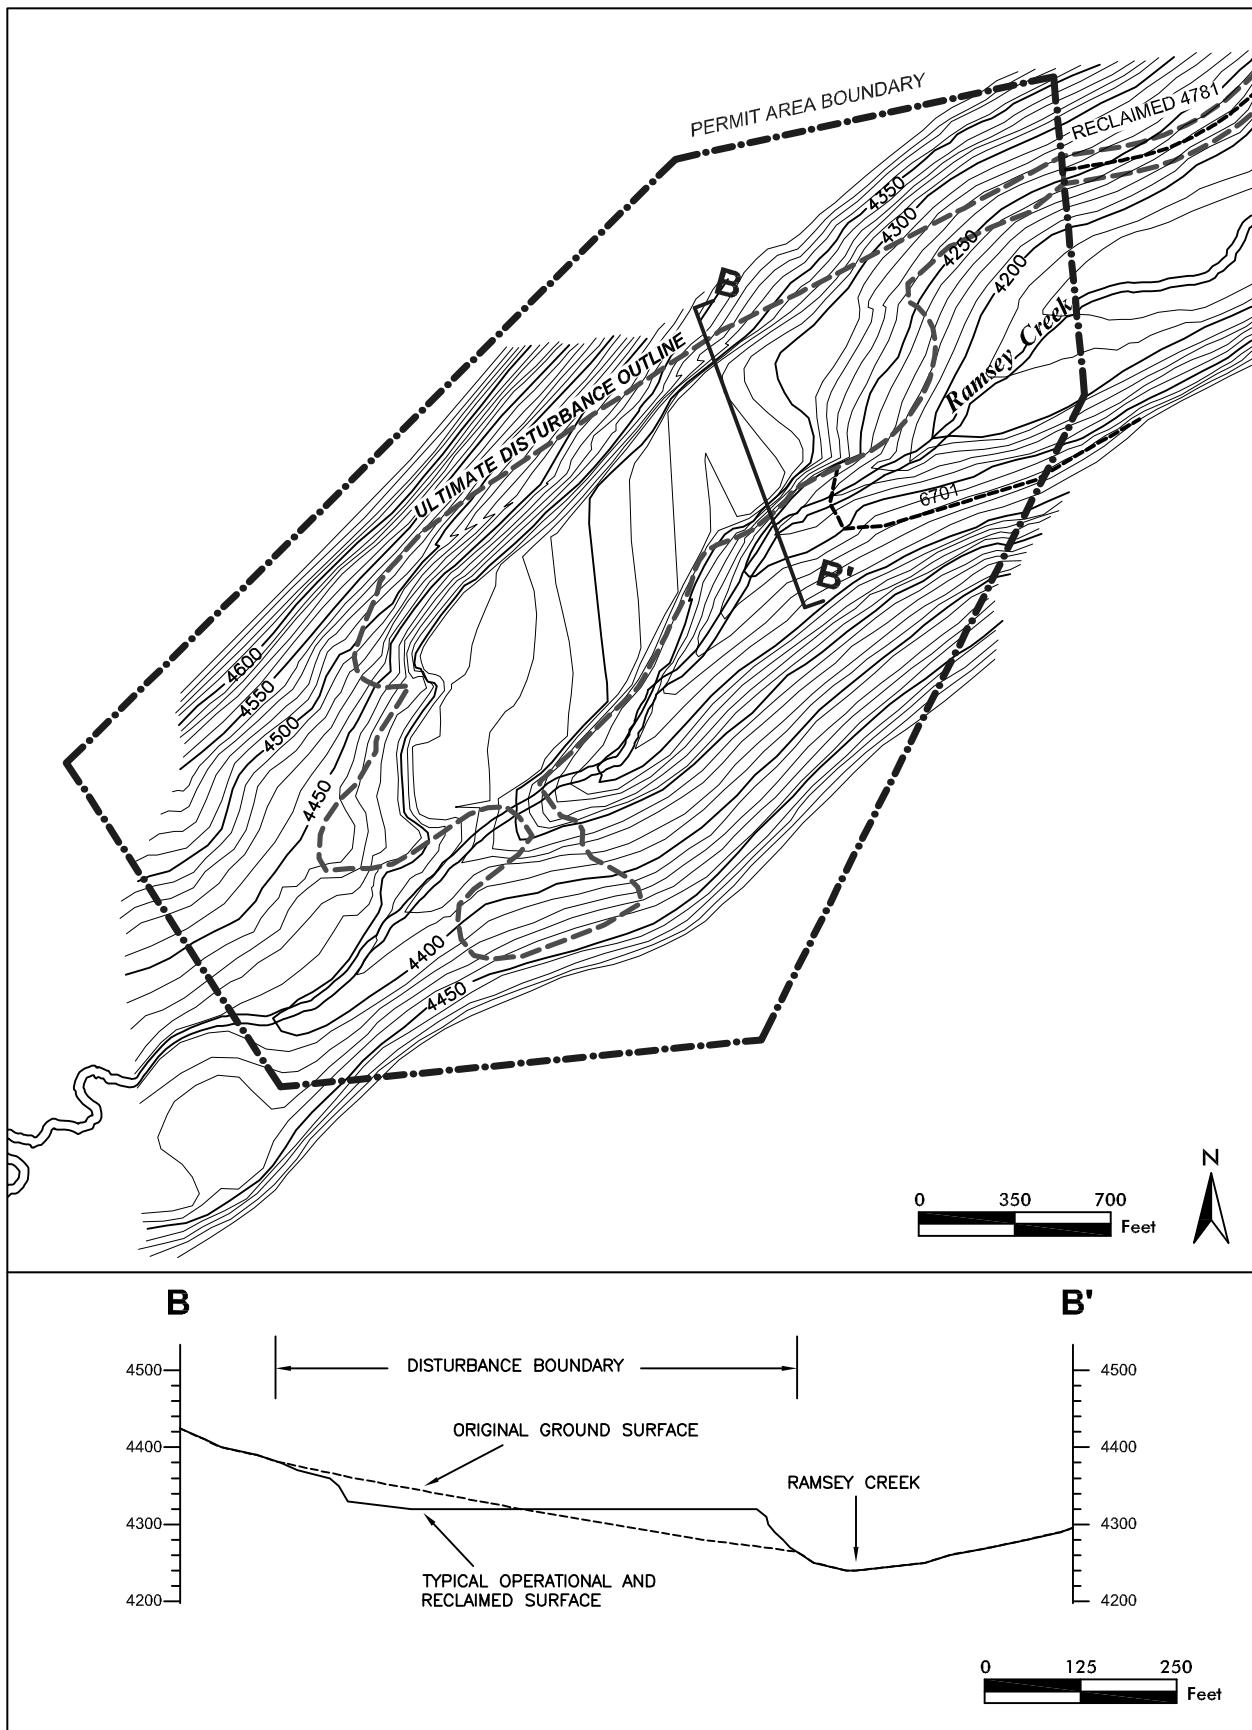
Post-mining Topography, Ramsey Plant Site, Alternative 2
